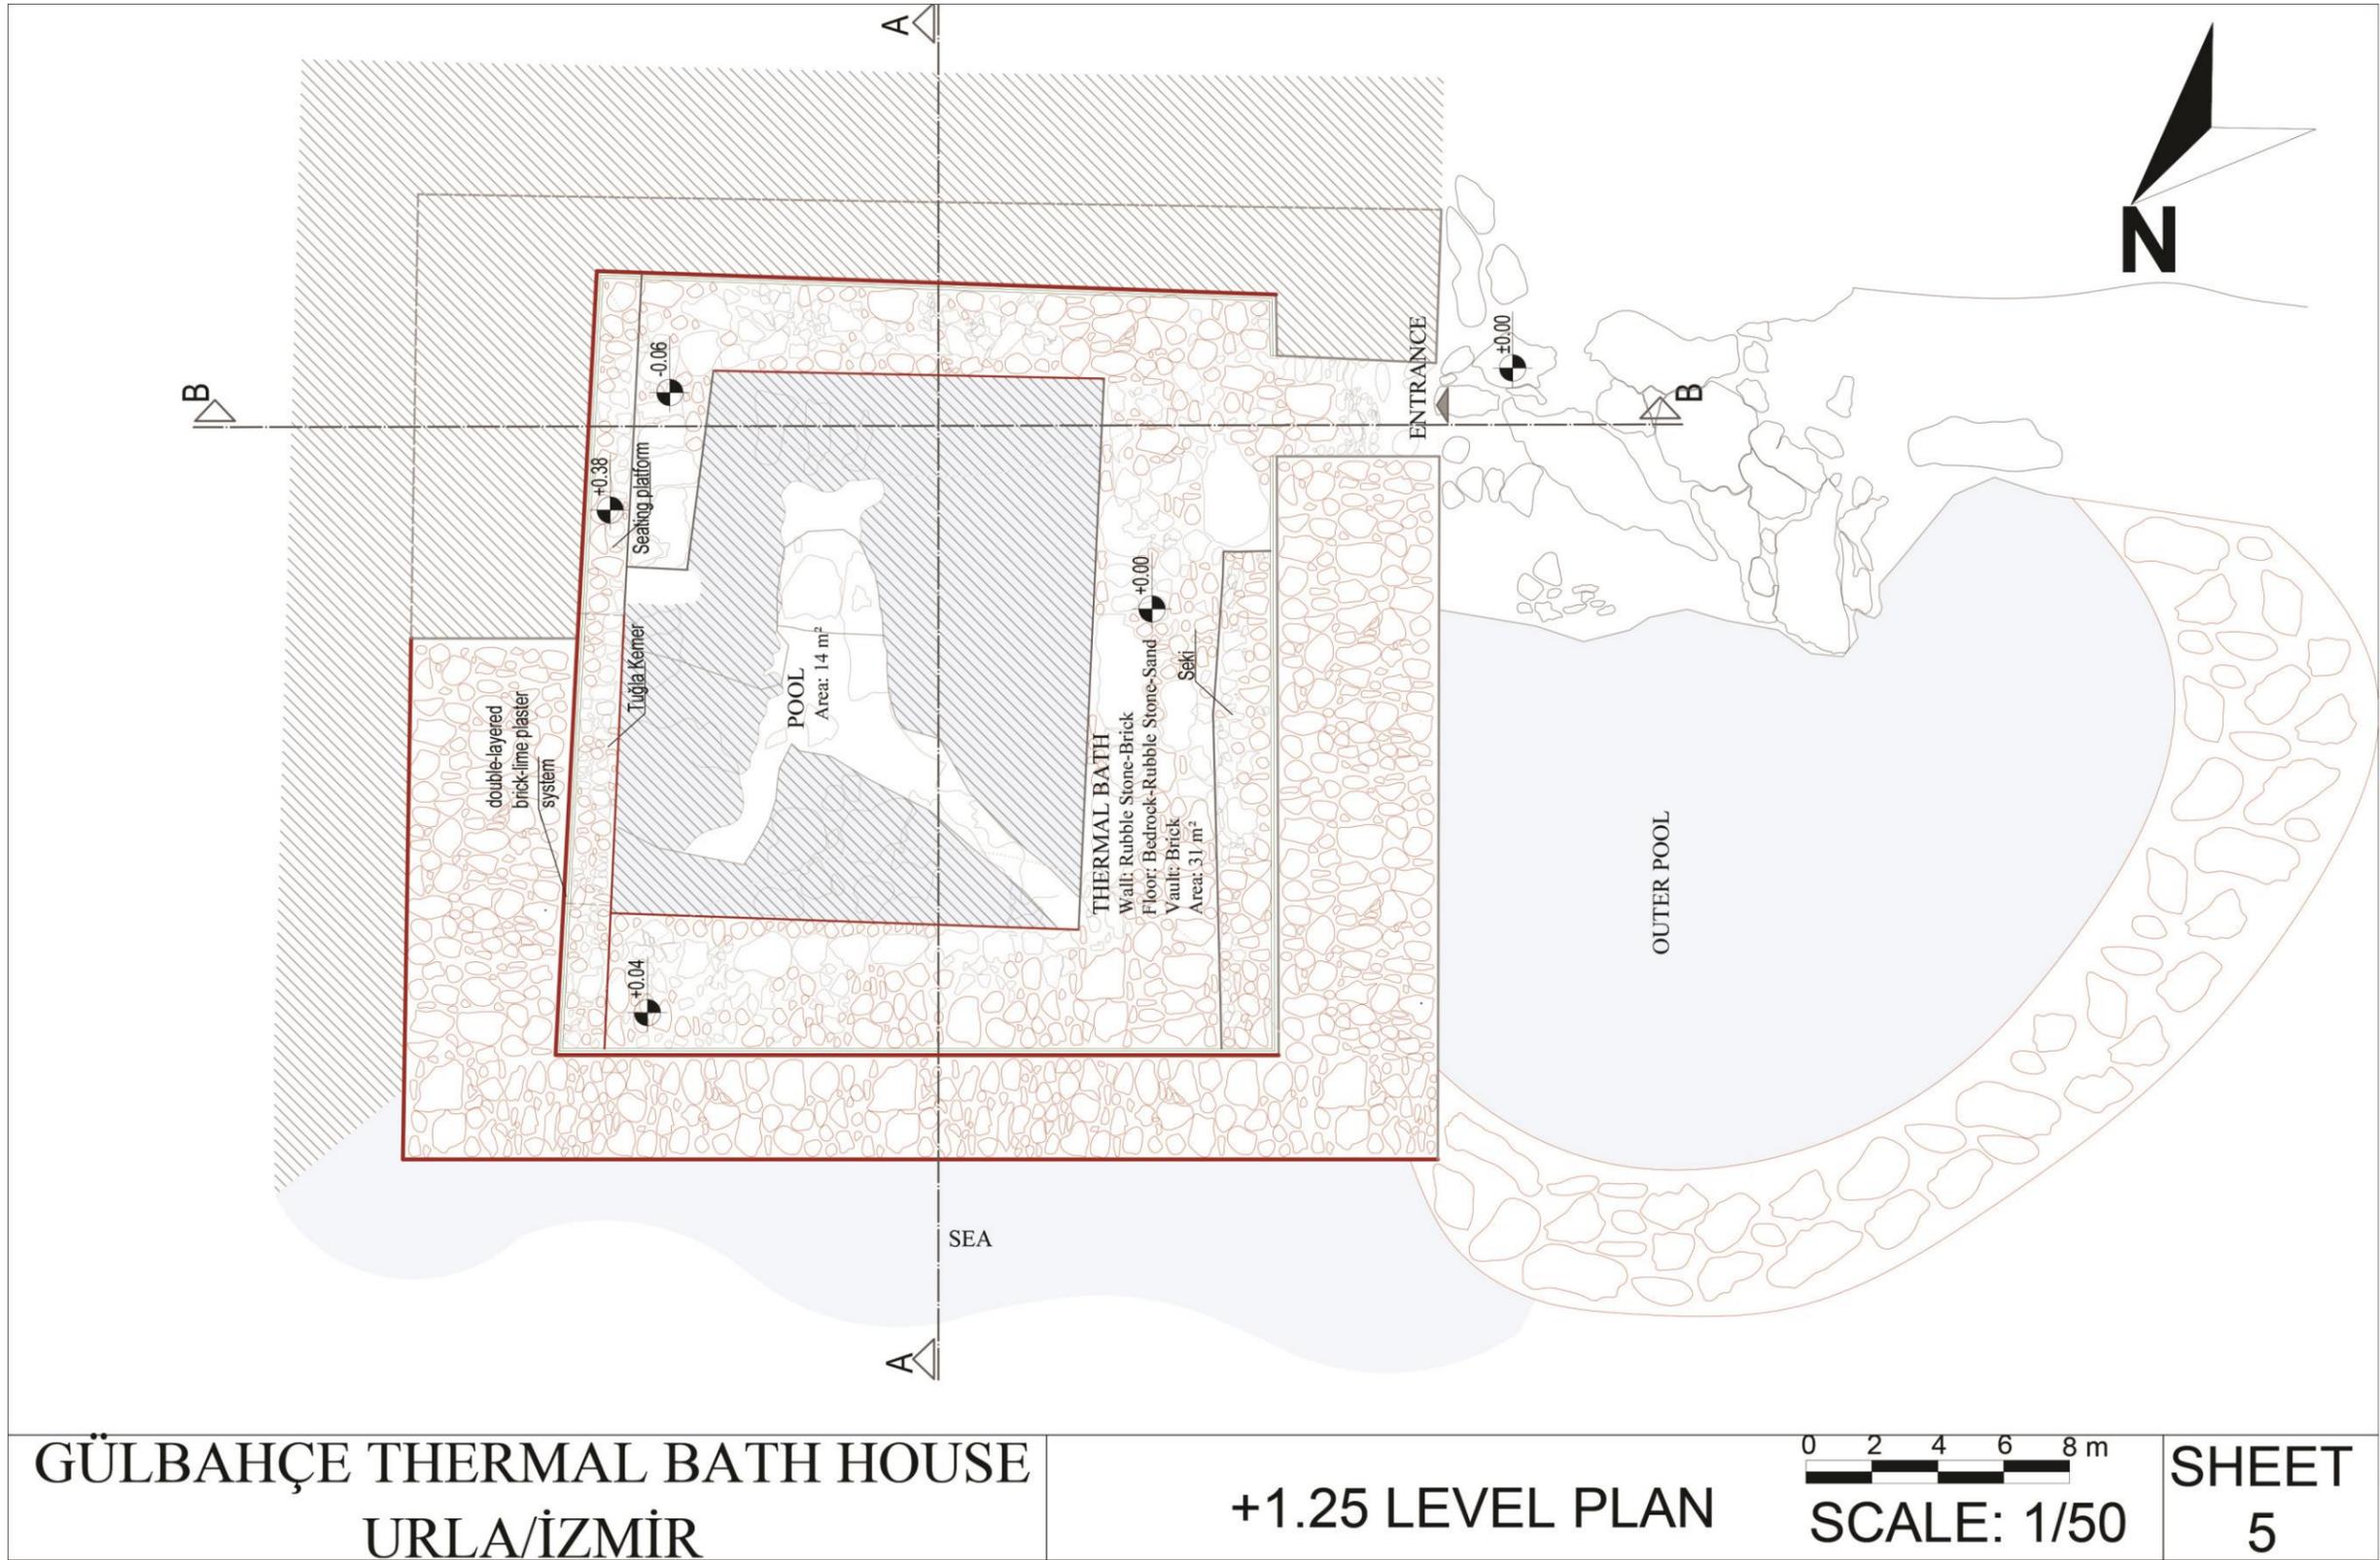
Plan-Restitution (Source: İYTE,2019)
